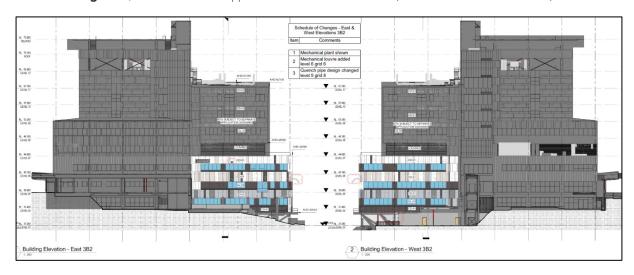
| SSD-6848-Mod-6 Proposed east and west elevations (Base source: SSD-6848-Mod-6)
